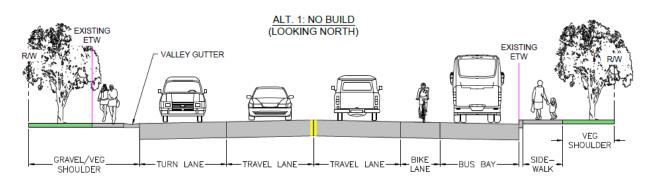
Ringwood Avenue Alternative 1 Near MAHS
